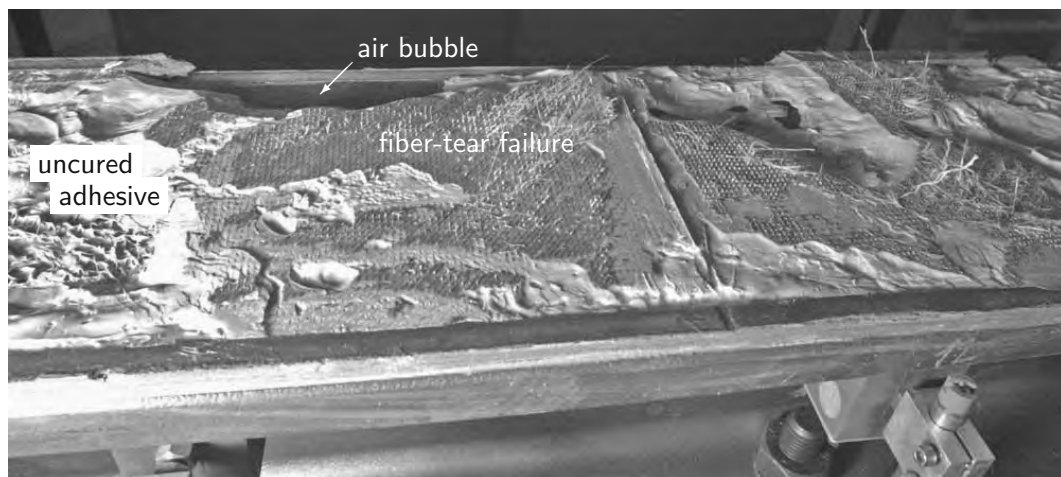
Surface of failed adhesive connection on steel girder (*C1-1*)
